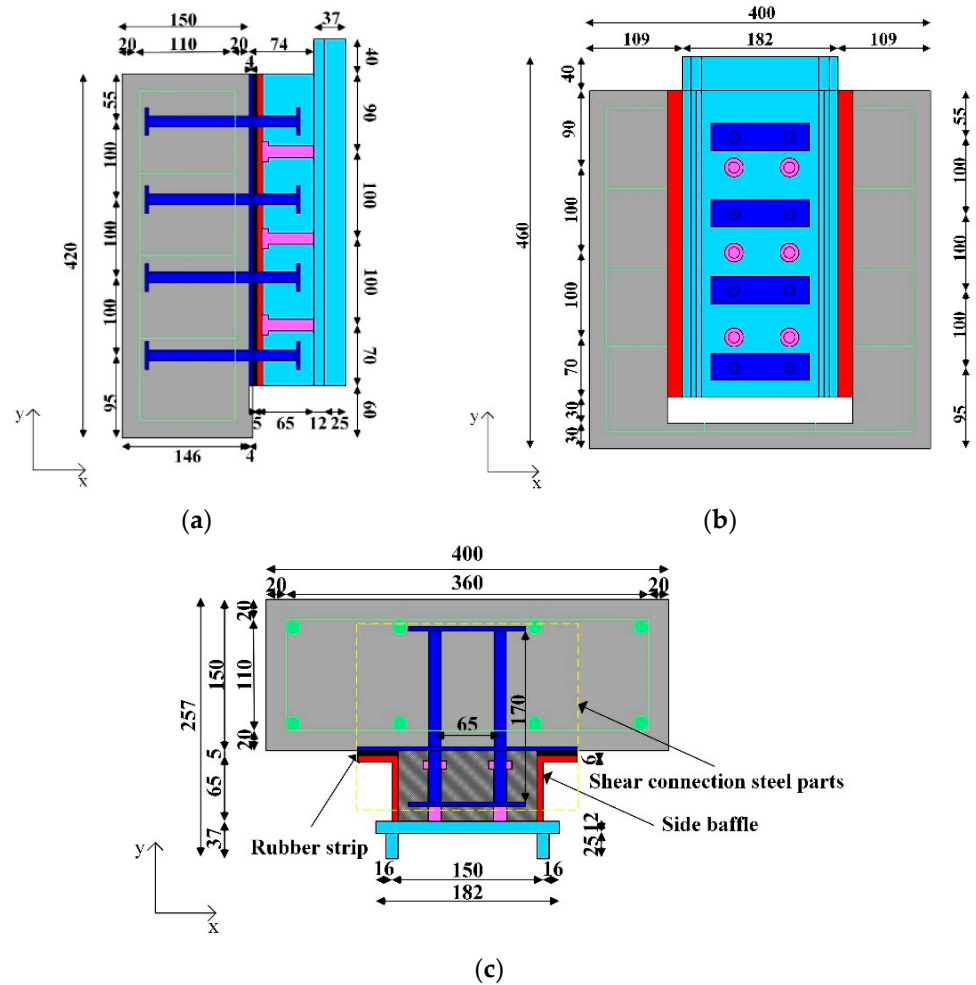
Details of specimens: (a) Front view; (b) Side view; (c) Top view. (Unit: mm).
